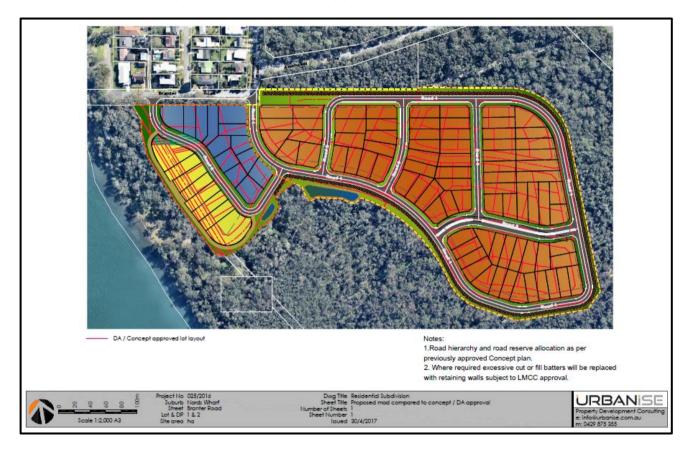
Overlay of proposed amendment to subdivision on original concept plan.
